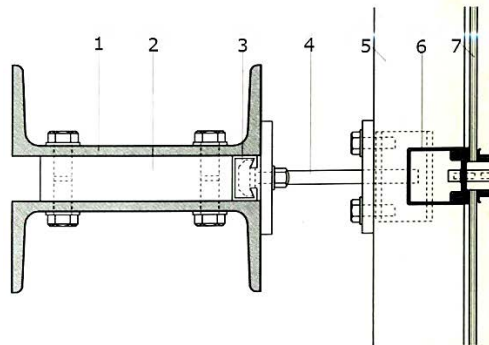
Hall 26, Hannover, Façade horizontal & vertical sections
